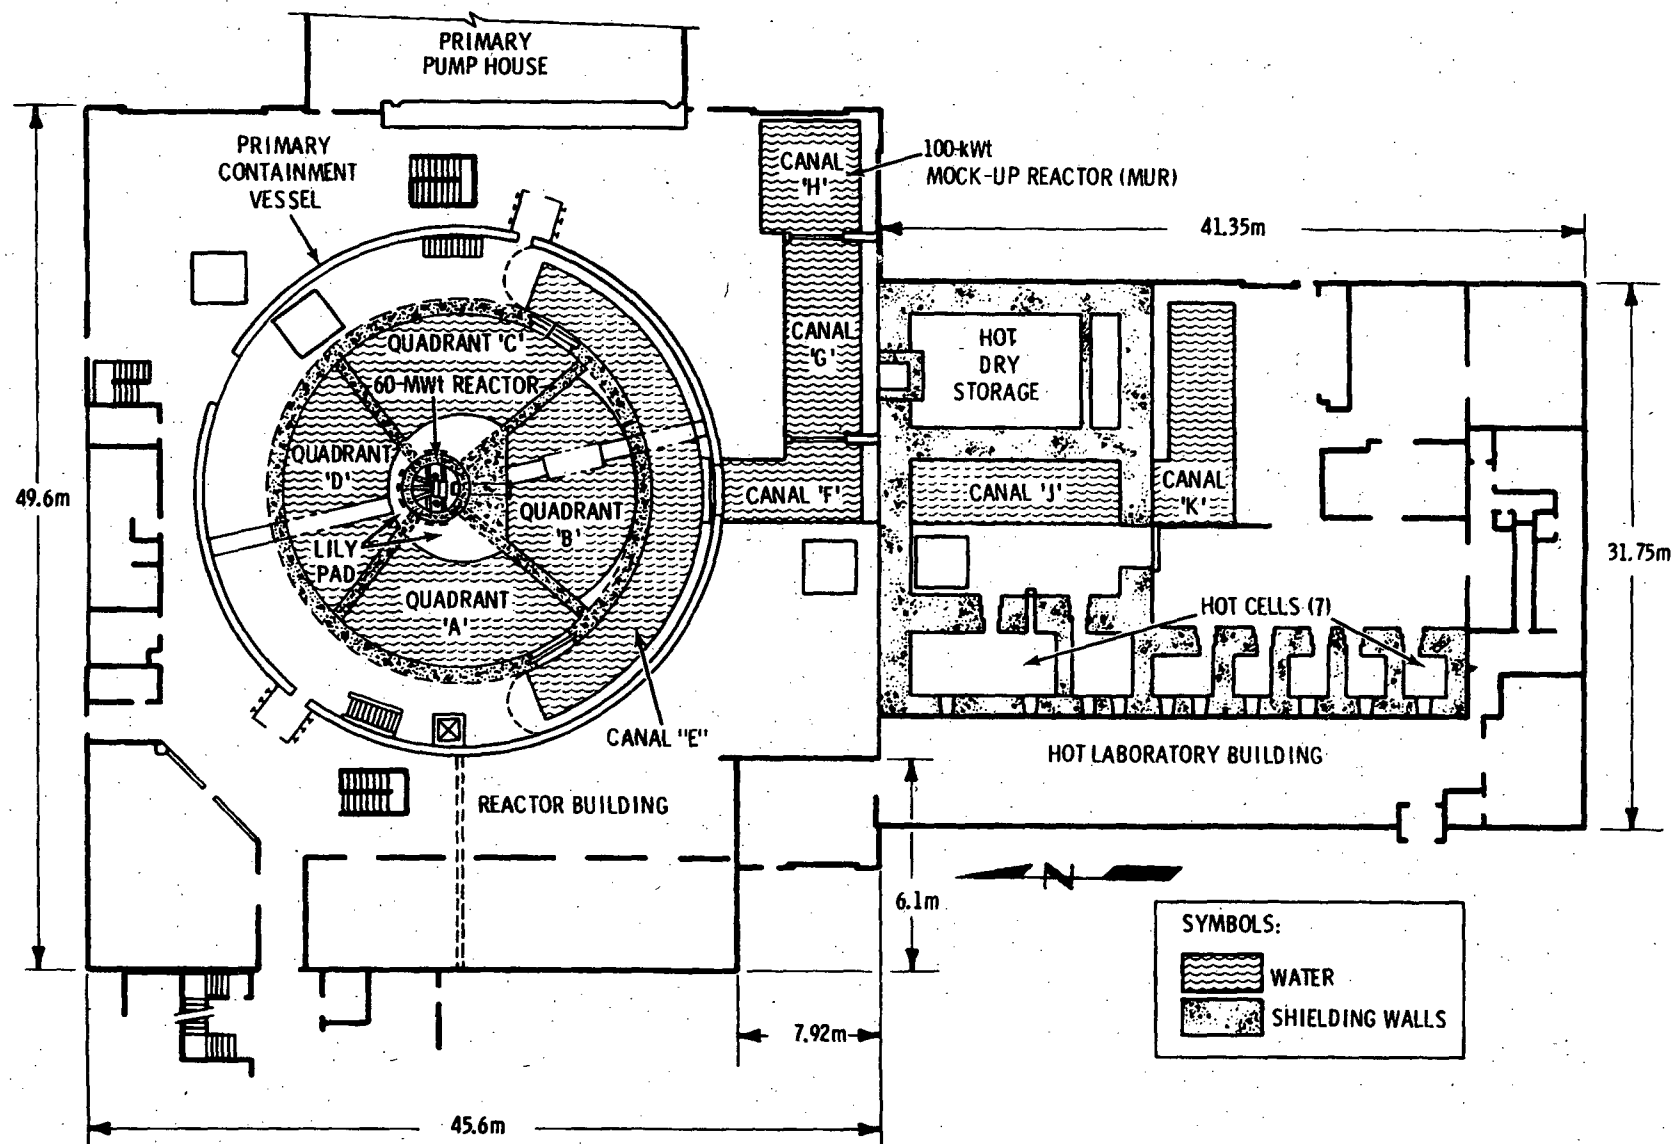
Reactor Building and Hot Laboratory Building Canal System--Plan View
